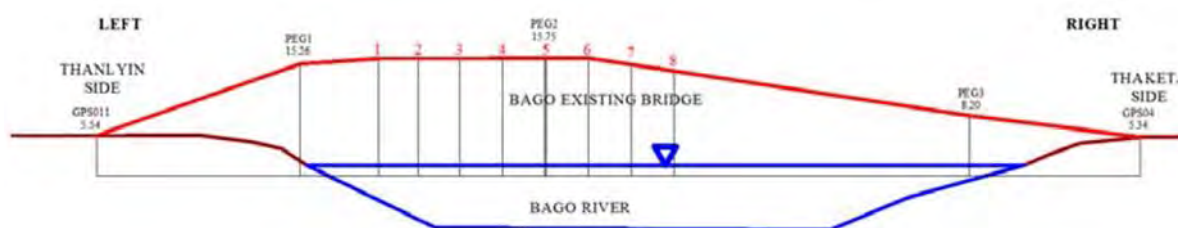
Location of Six Survey Points for Thanlyin Bridge Girder Soffit
